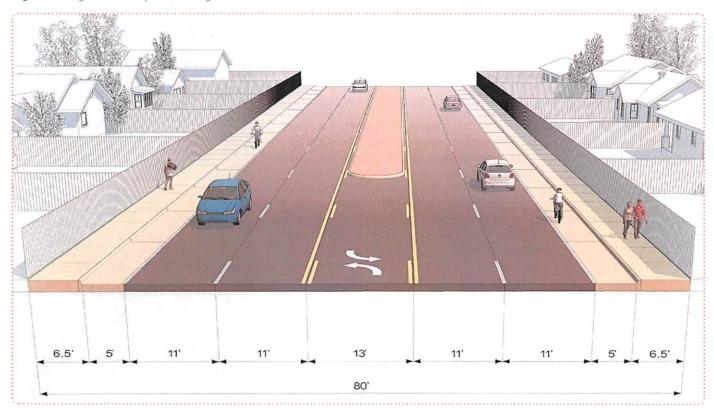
Proposed Dell Range Cross-section, College Dr to Van Buren Ave
